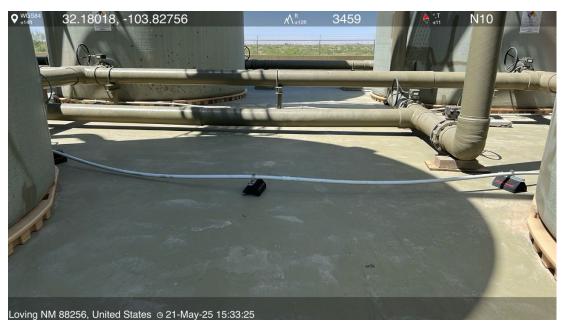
/21/2025	Direction Facing	north	Photo 10
